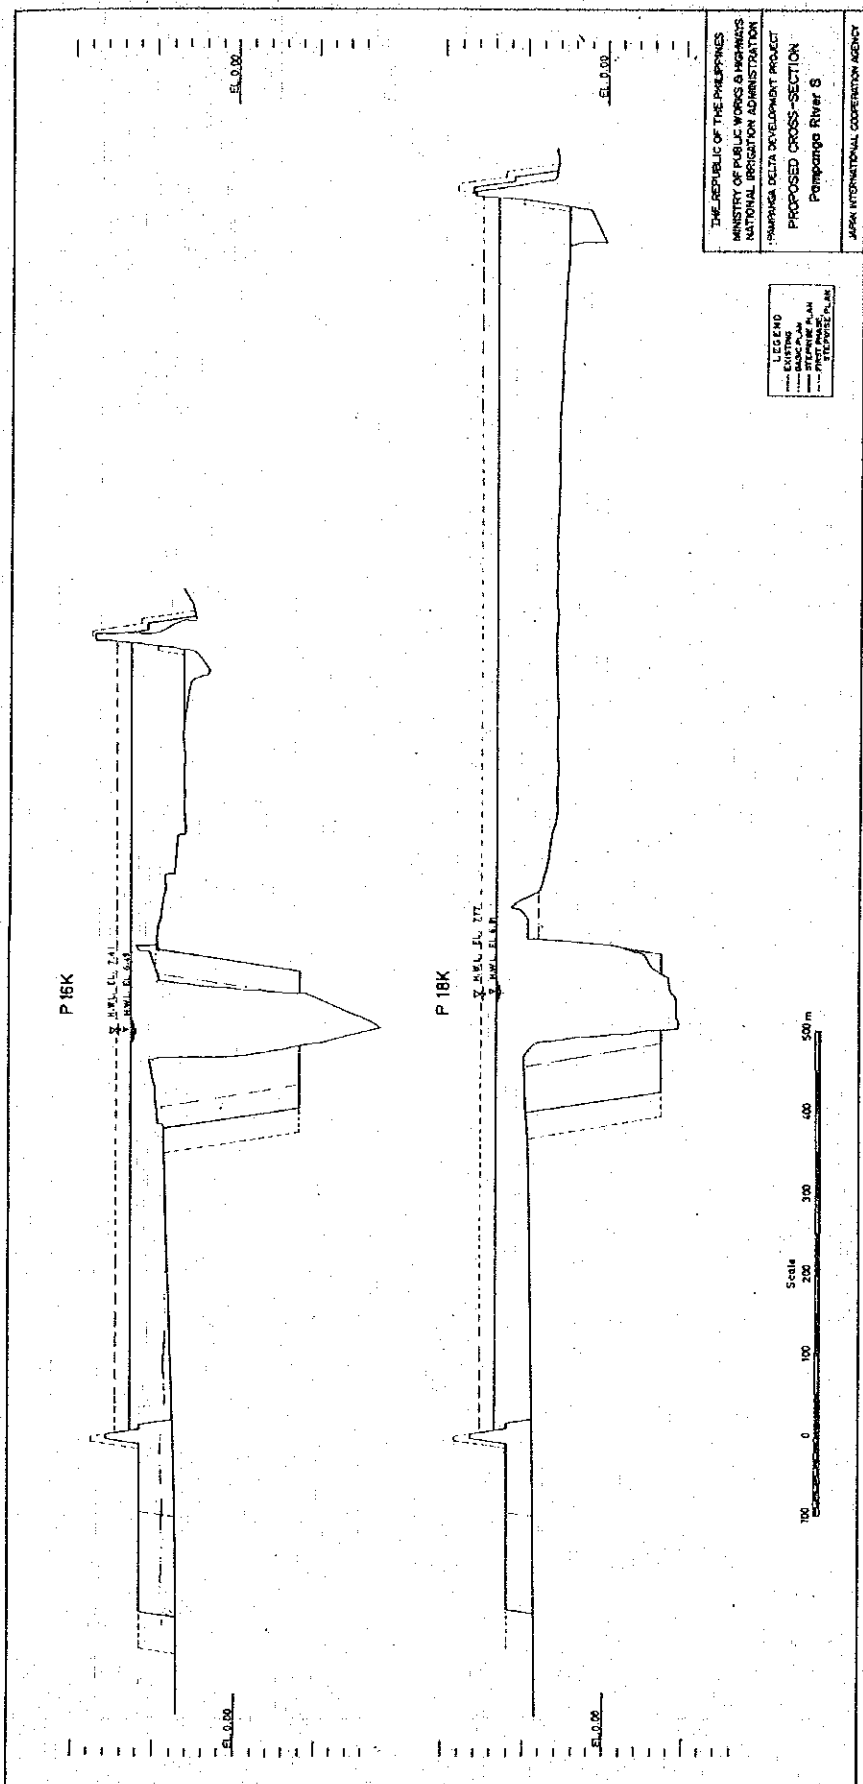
(9) PROPOSED CHANNEL CROSS-SECTION
